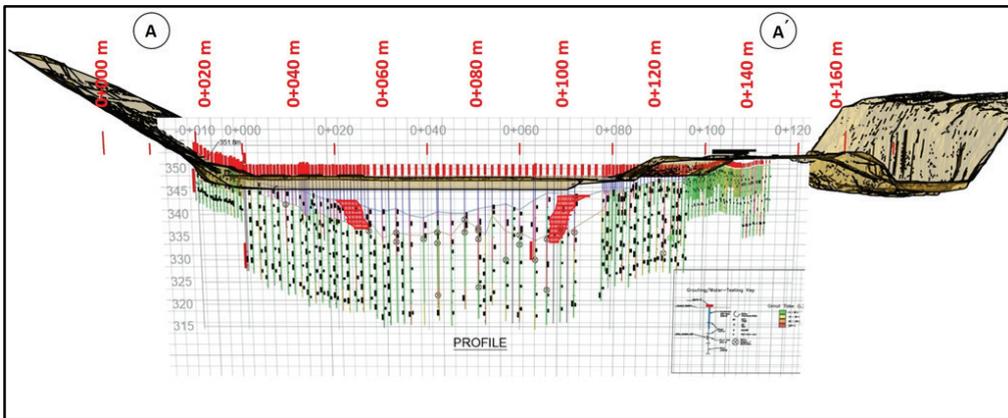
Longitudinal Profile As-built Drawing of Grout Curtain
